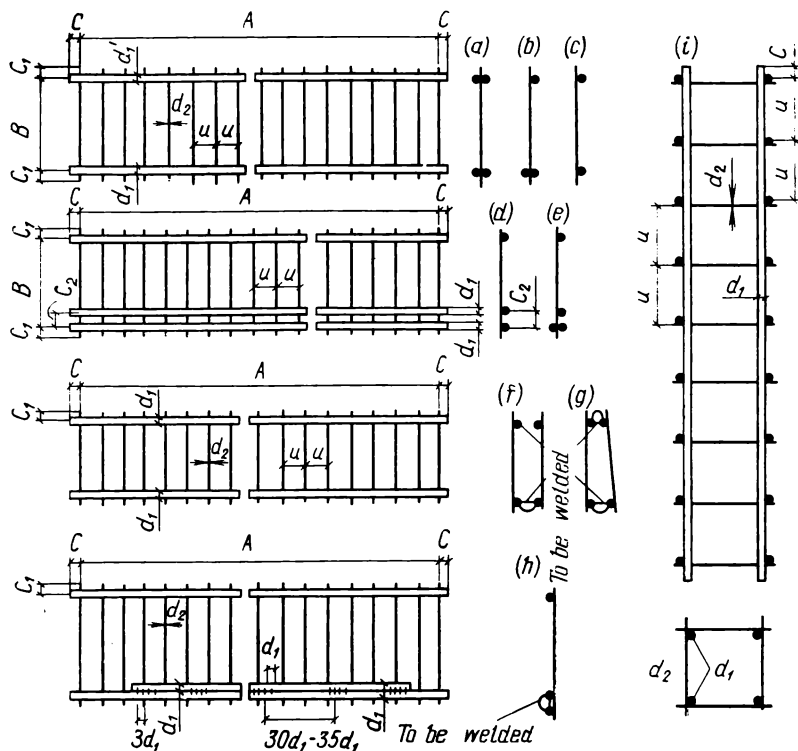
(a) through (h) welded-bar mats; (i) reinforcing cage
